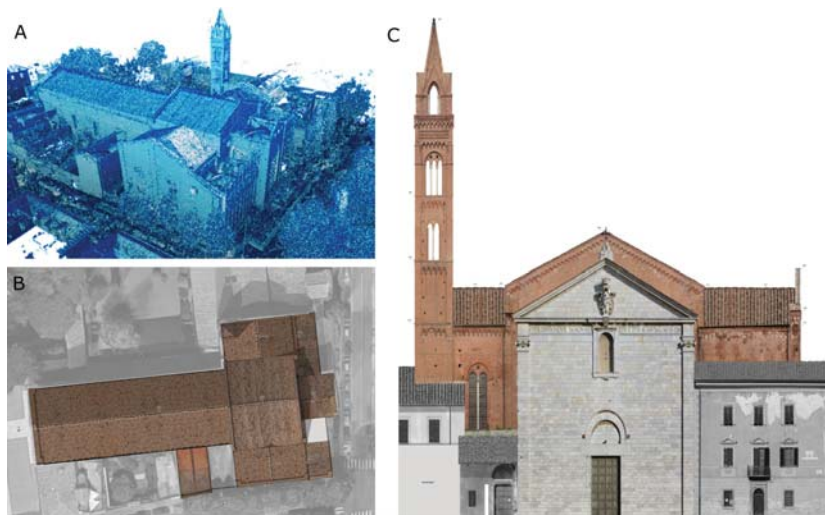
A) Point cloud survey; B) planimetry; C) façade of the San Francesco church.
